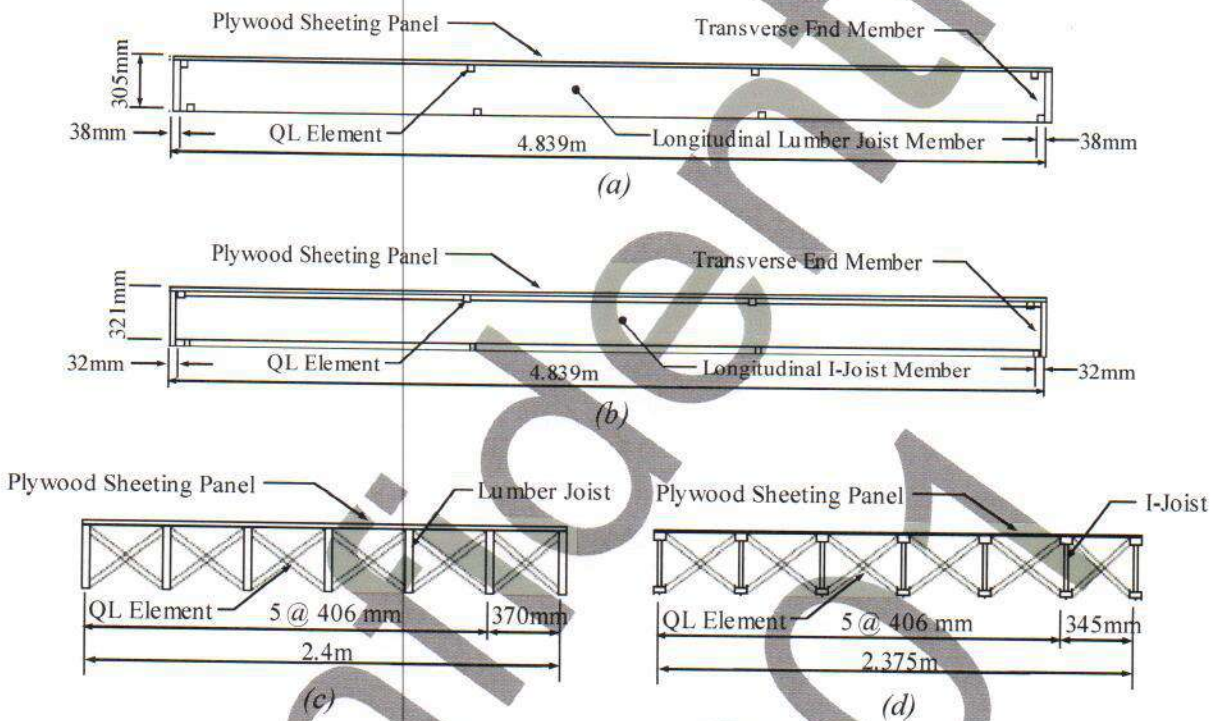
Schematic section view of the specimens: a) Section A-A (lumber joist specimen); b) Section A-A (I-joist specimen); c) Section B-B (lumber joist specimen); d) Section B-B (I-joist specimen)
